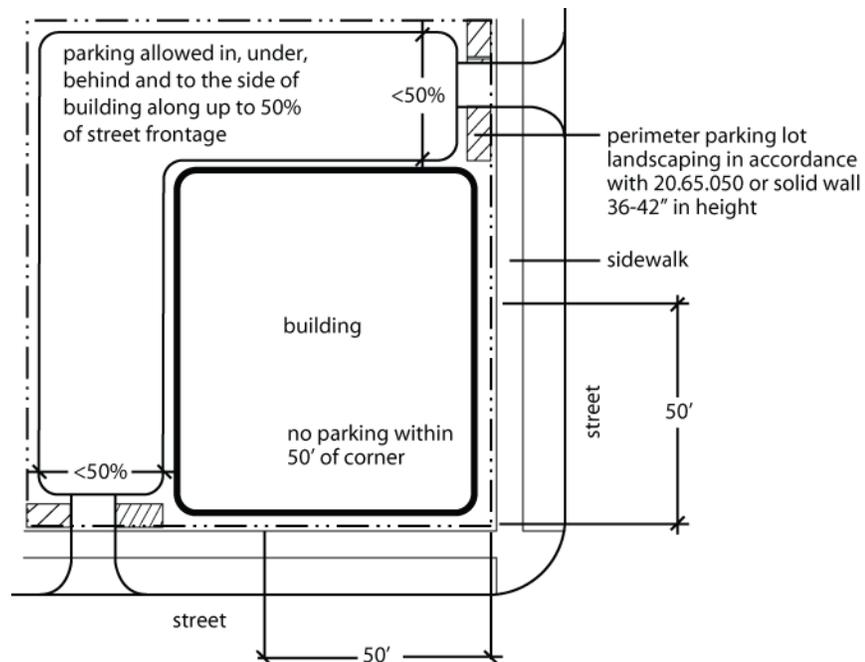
/NC-SR Overlay, Parking, Location , Corner Parcel
